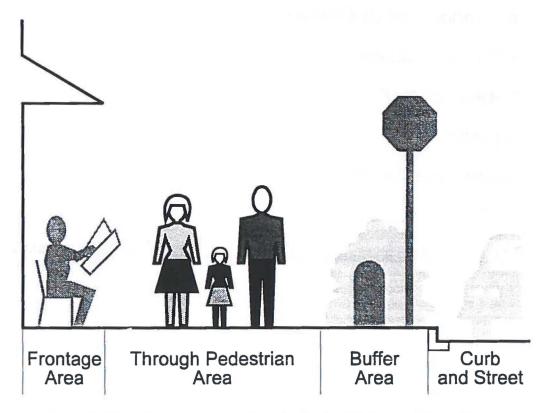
Sidewalk Areas (adapted from the Portland Pedestr:an Master Plan)
